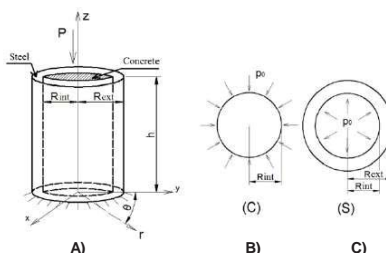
The design model; A) a concrete-filled steel tube column; B) the concrete core cross section of the column; C) the steel tube cross section of the column
